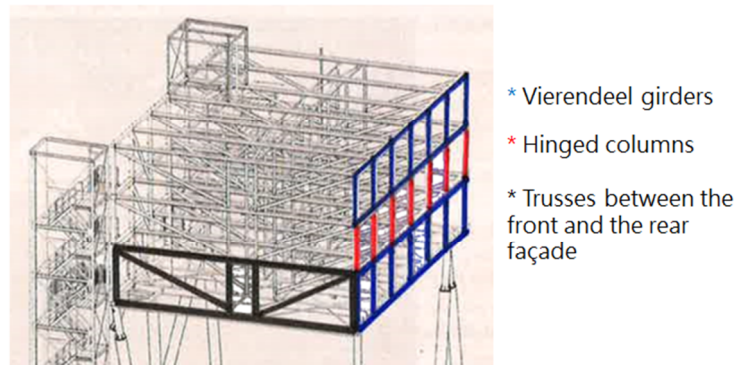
Zeemanshuis - Upper structure of the first extension
